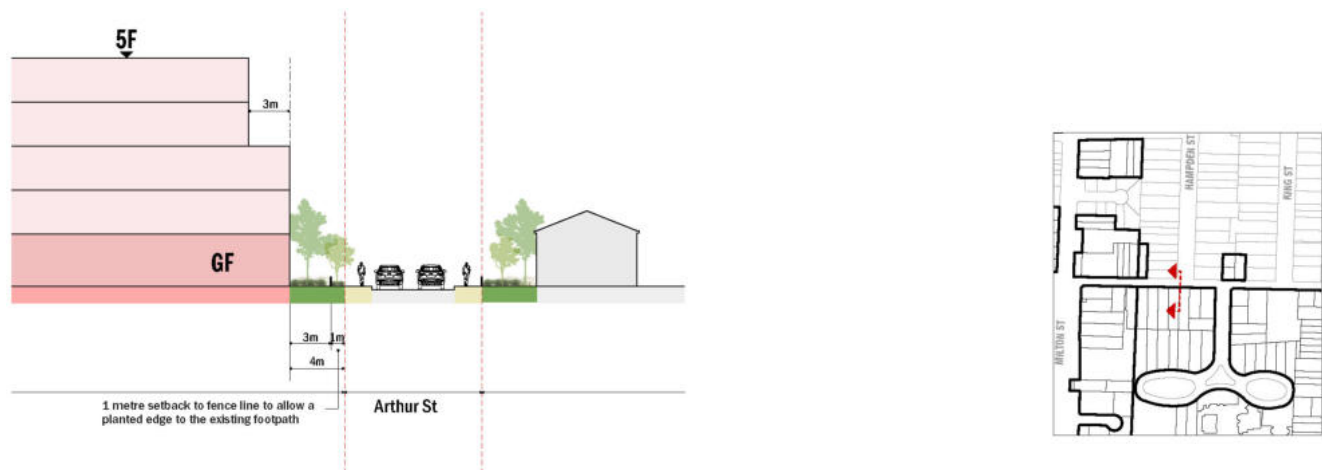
Southern Village – Arthur Street Section – Mid Rise Interface
